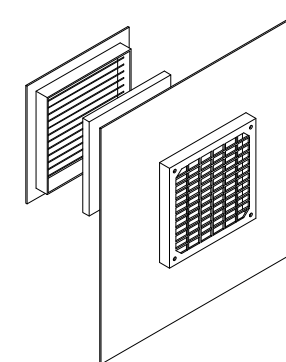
VENTILATION LOUVRE (TYPICAL)
